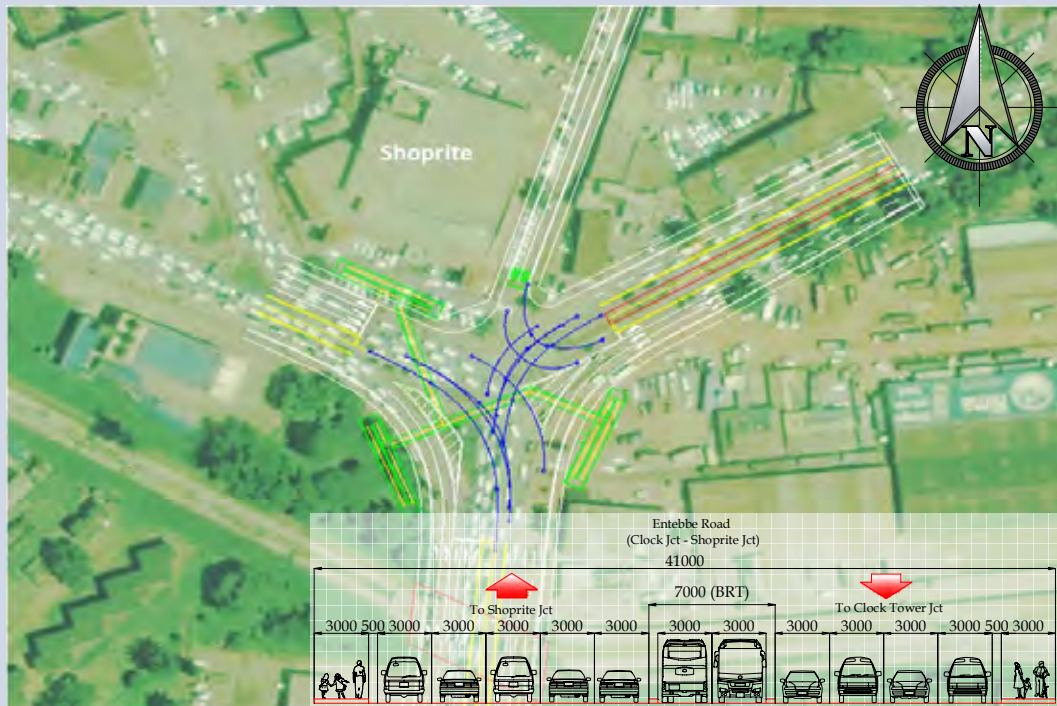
Shoprite/Clock Tower Jct. Improvement Plan (Alt.-2)
